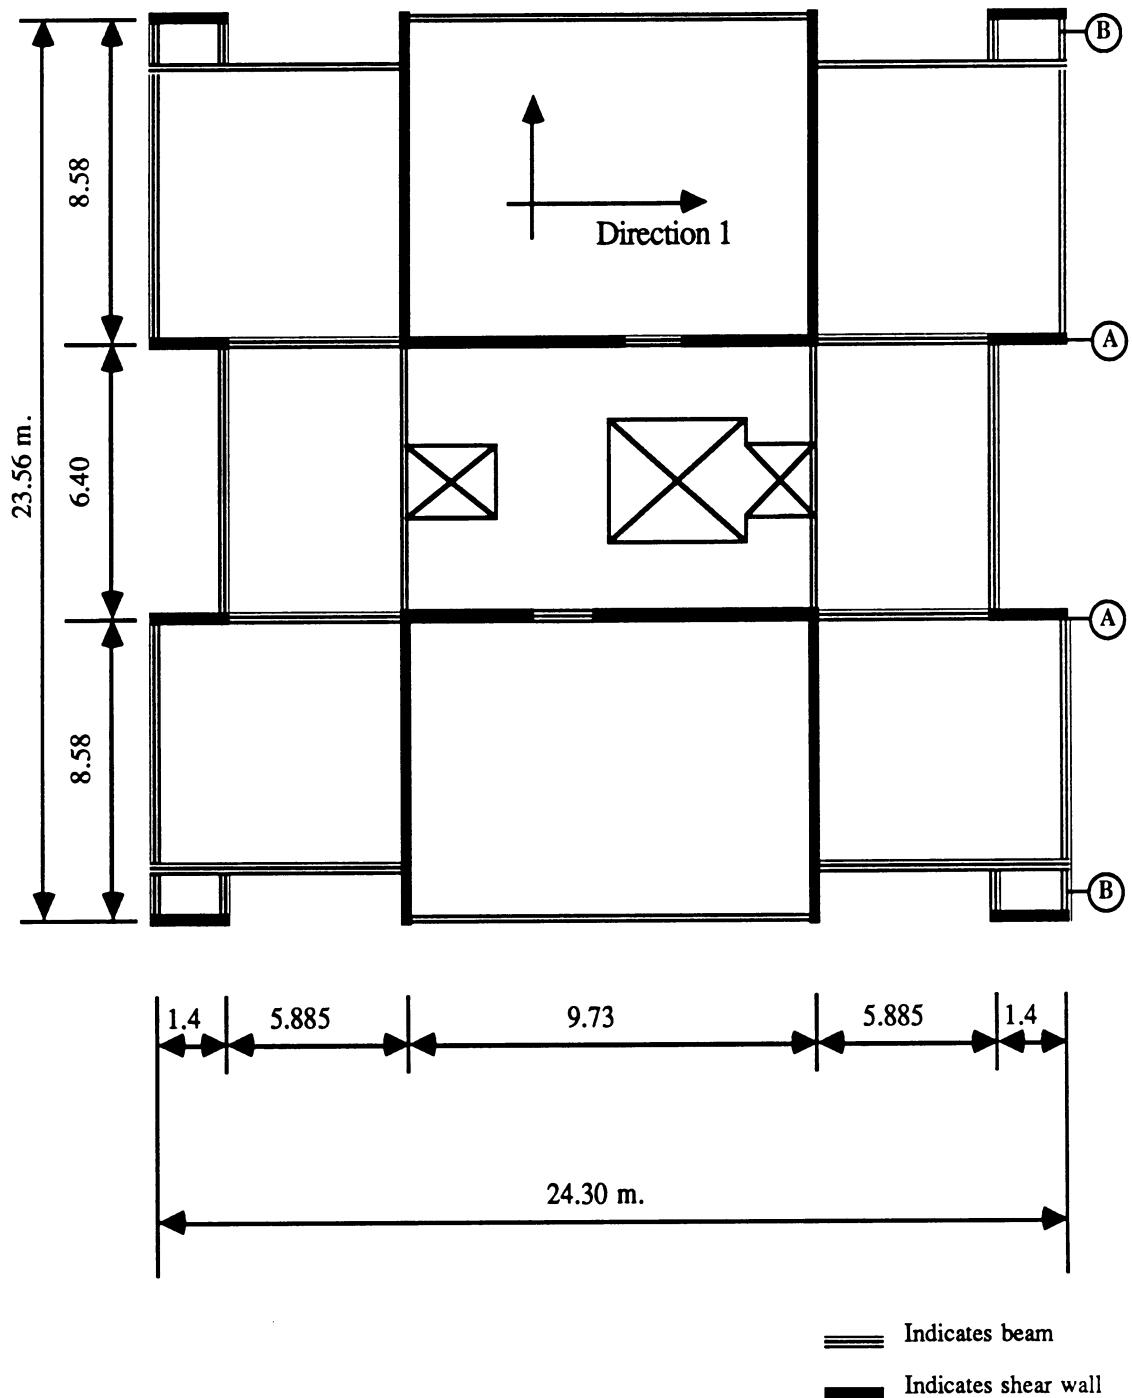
(a) : Plan View of a Typical Story of Almendral Building.
